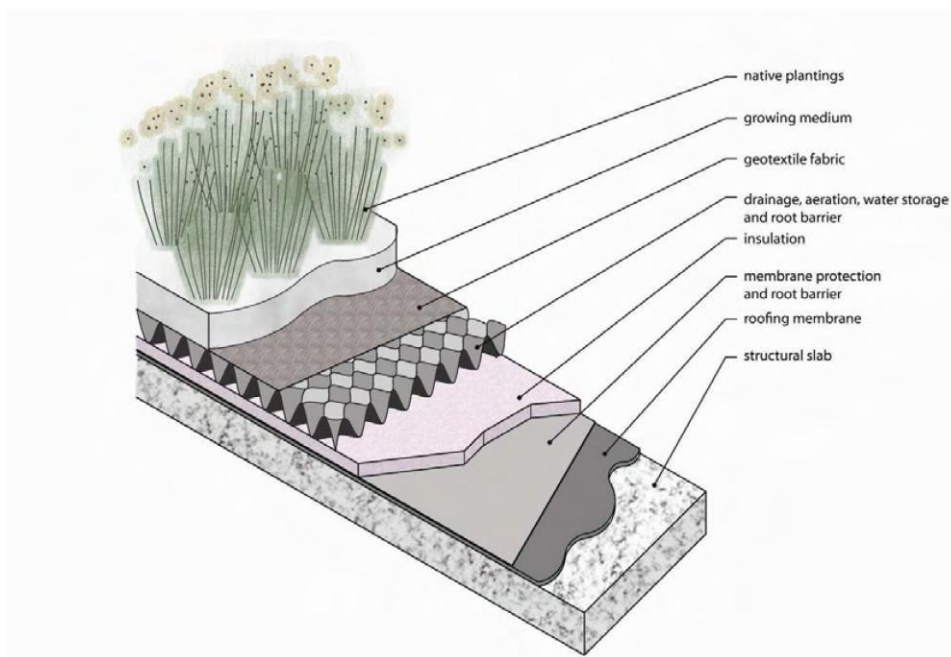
Typical Green Roof Cross-section (Source: City of Chicago, 2014).
